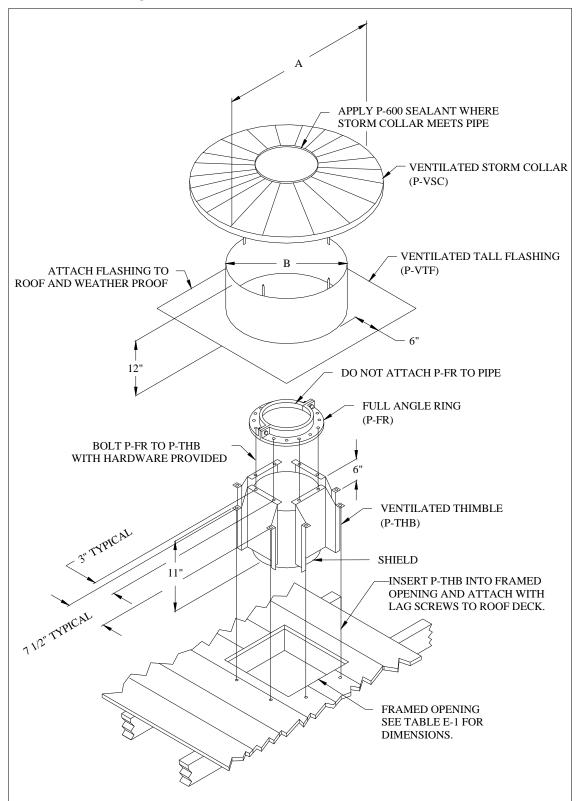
Installation of Ventilated Roof Thimble (P-MVT)
